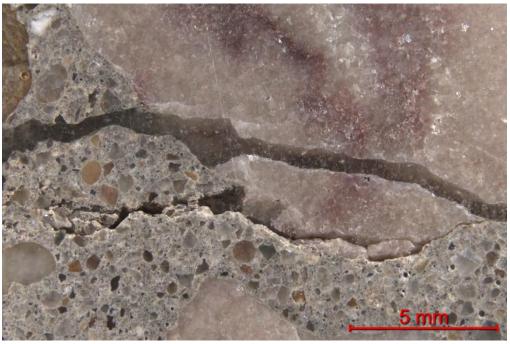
Lapped section of Core C5 showing the horizontal cracking of the core.
